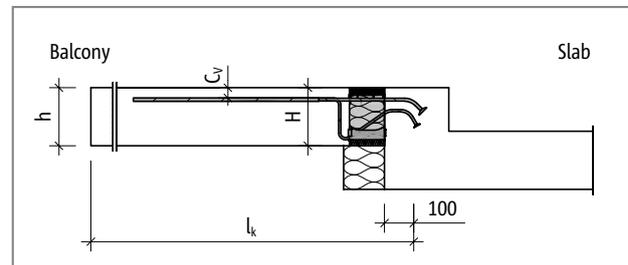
Schöck Isokorb® XT type K-O: Static system
